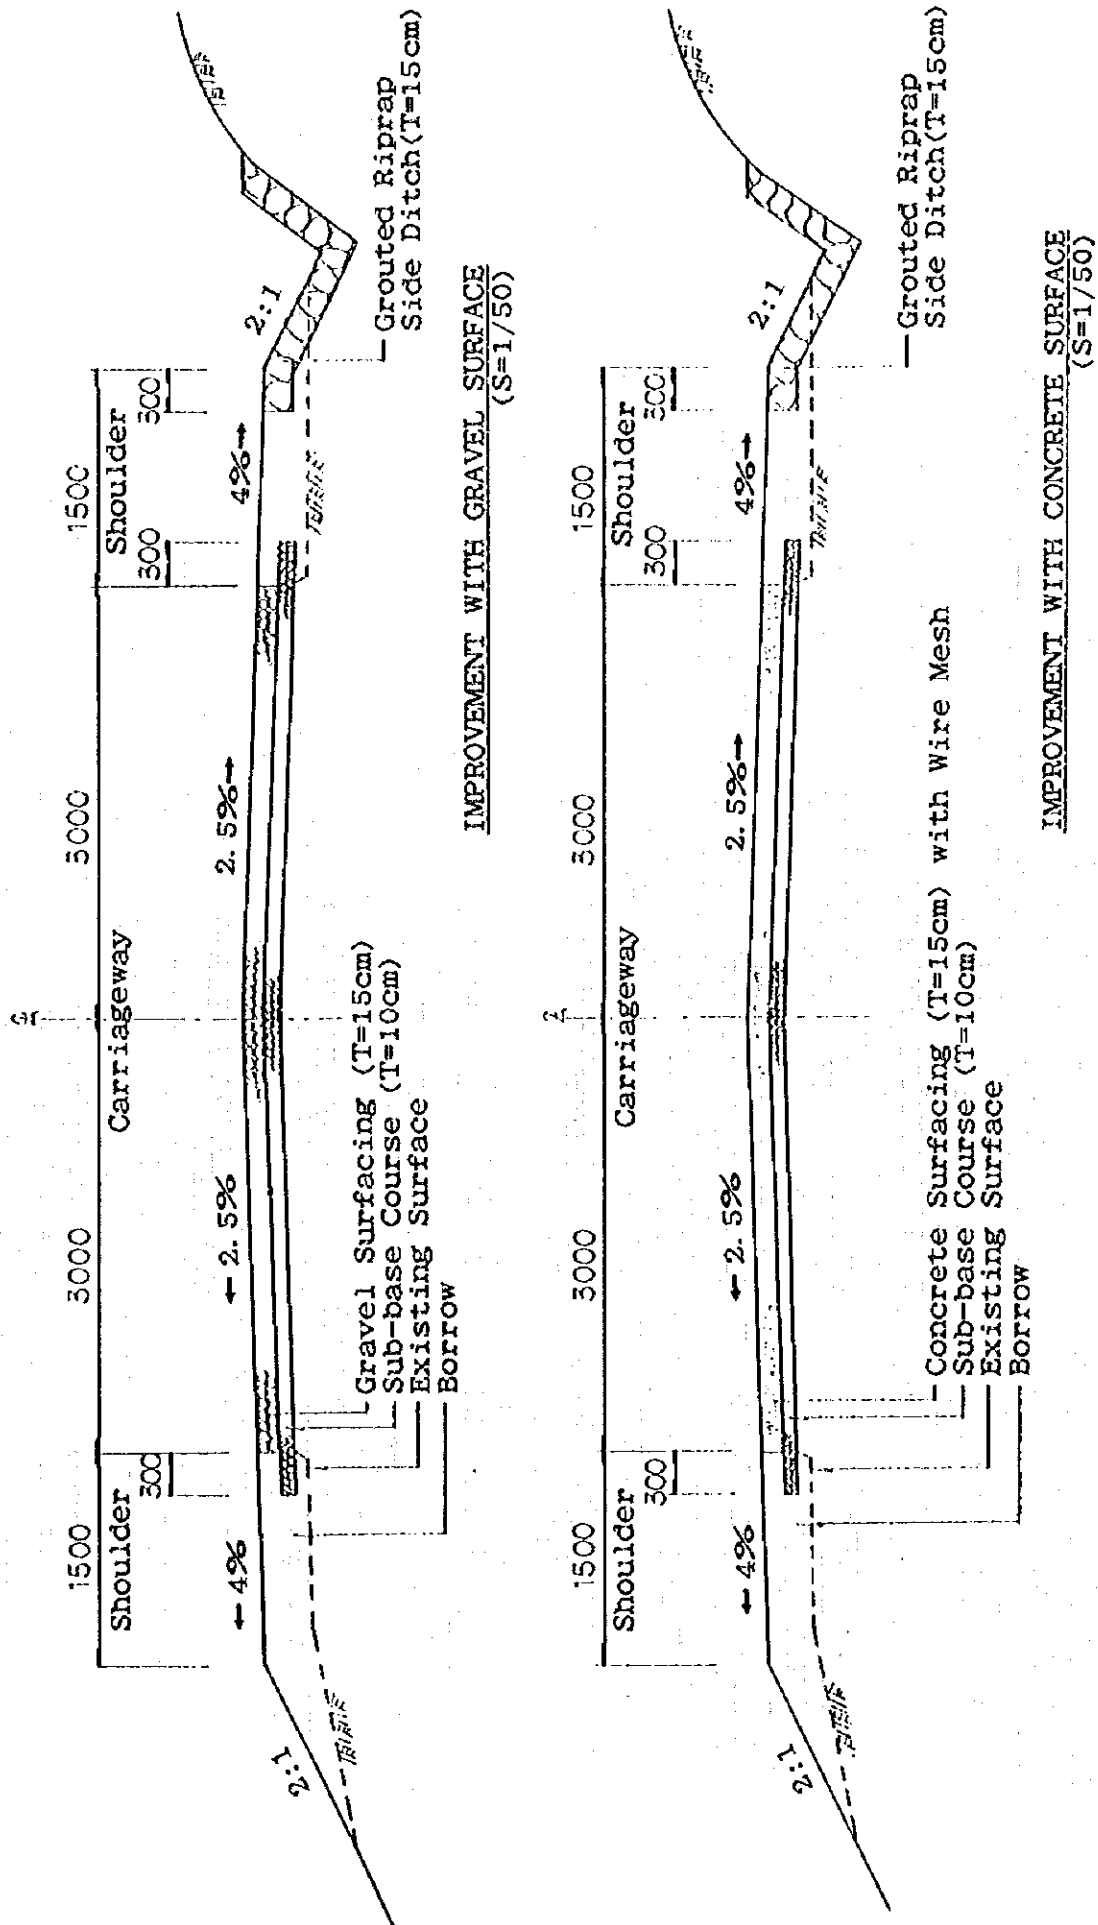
STANDARD CROSS SECTION OF PROVINCIAL ROAD
